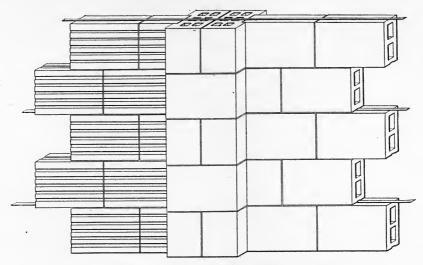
Tile wall for four-story building. Thickness 4 to 12 in.
